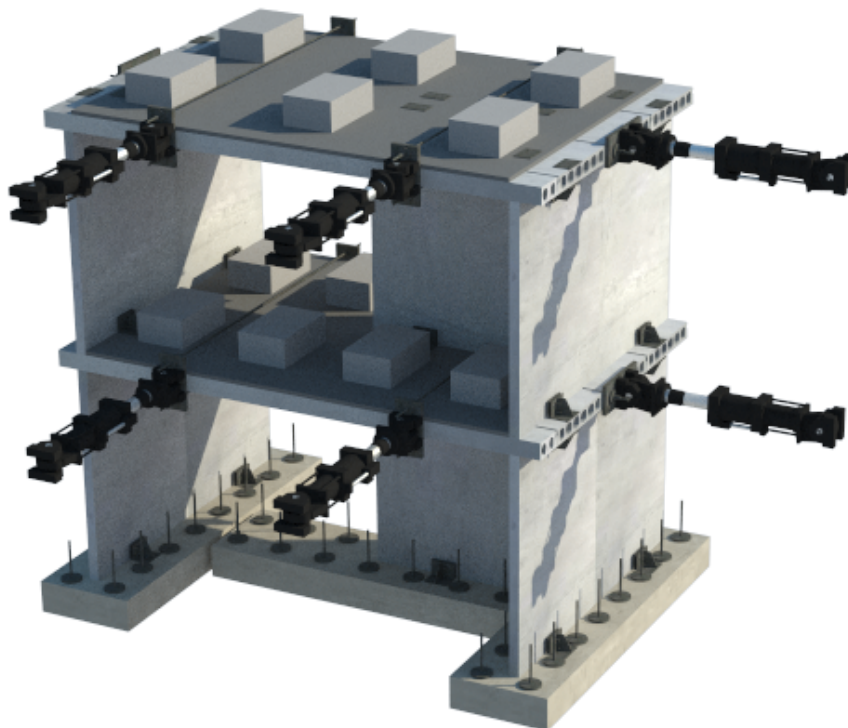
Isometric views of the installed instrumentation – Top side, back view.
